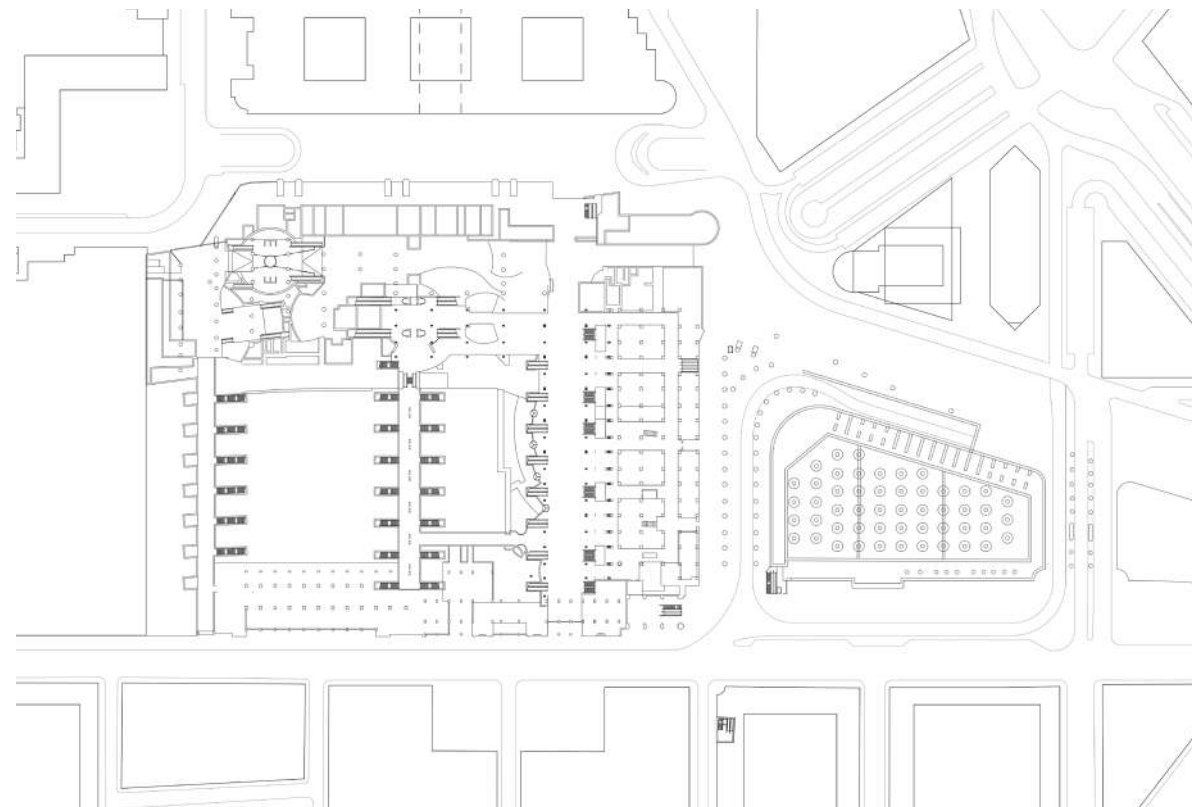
Schematic plan of the ground floor of Brussels-South
